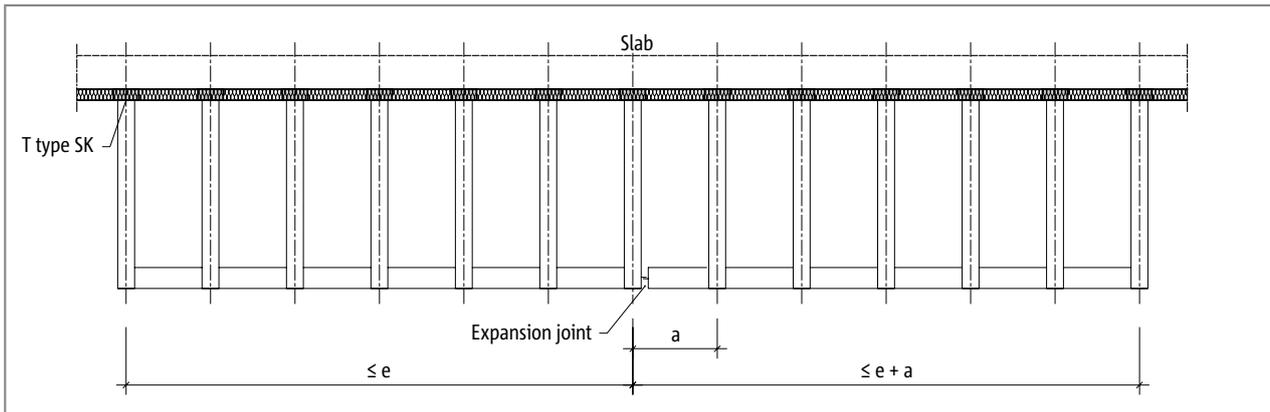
Schöck Isokorb® T type SK: Maximum expansion joint spacing e
